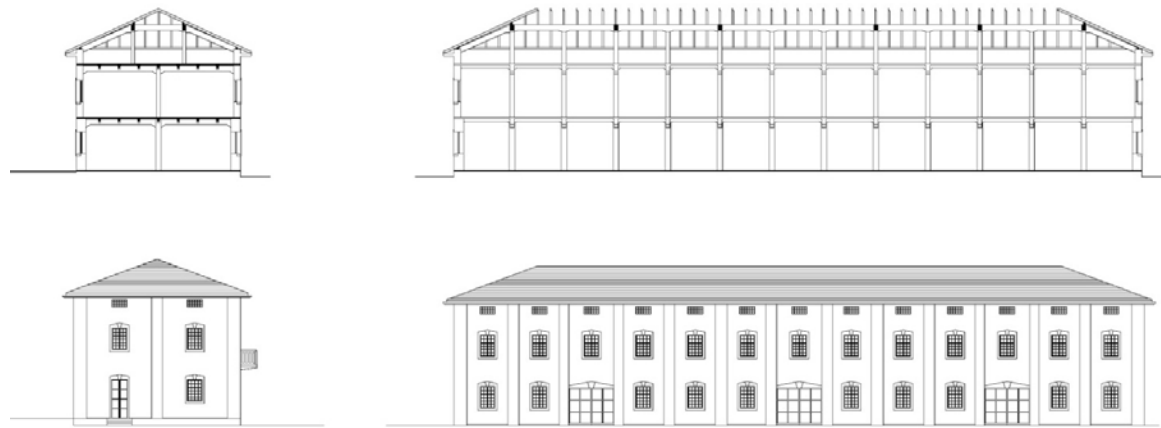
“Teresa” building warehouse. Cross and longitudinal sections, elevation views from south and west, respectively.
